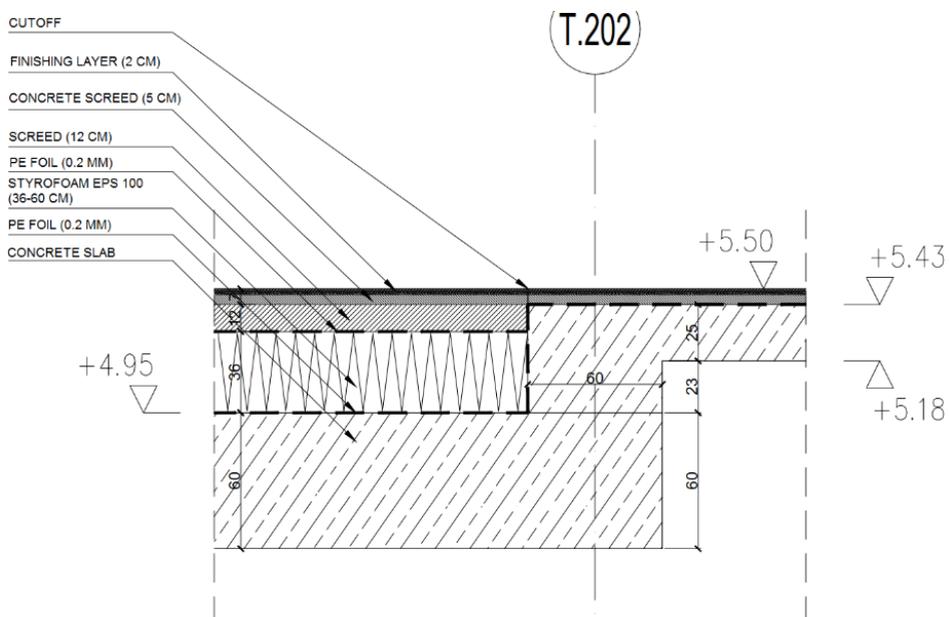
The designed layout of the floor finishing layers above the railway tunnel according to [1].
